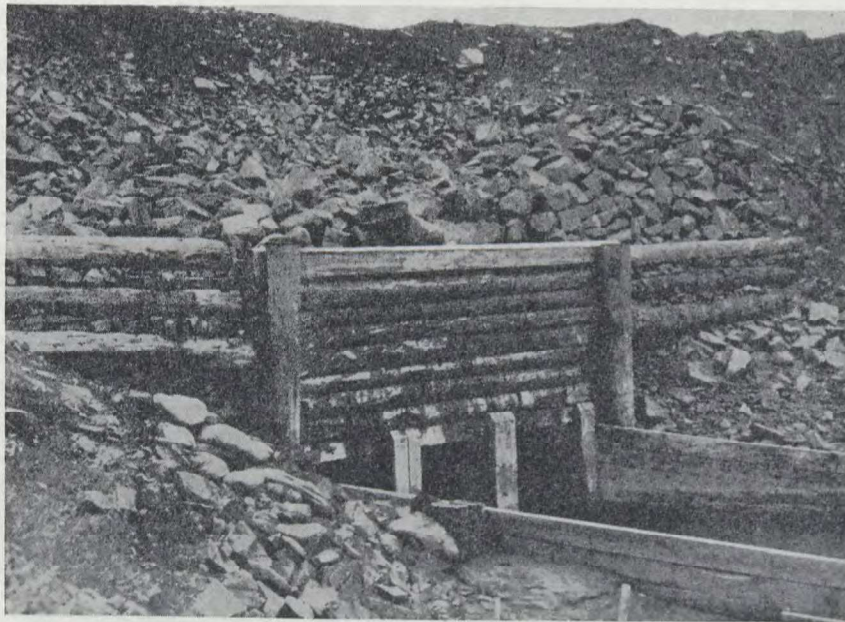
A well-built sluiceway. It has 3 spillways 3 by 5 feet inside measurements, with brass gates.
